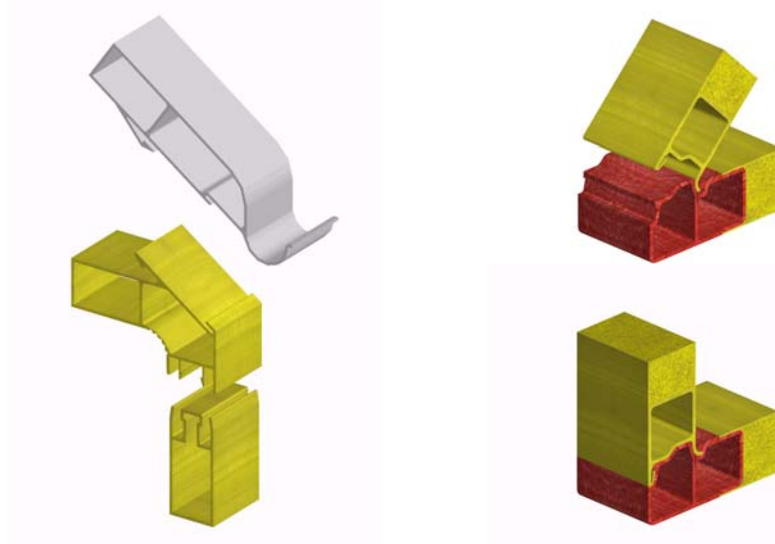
Snap-joining technology: Left - wall-ceiling-roof connection with integrated gutter, Right– Tilt installed wall-to-floor joint
